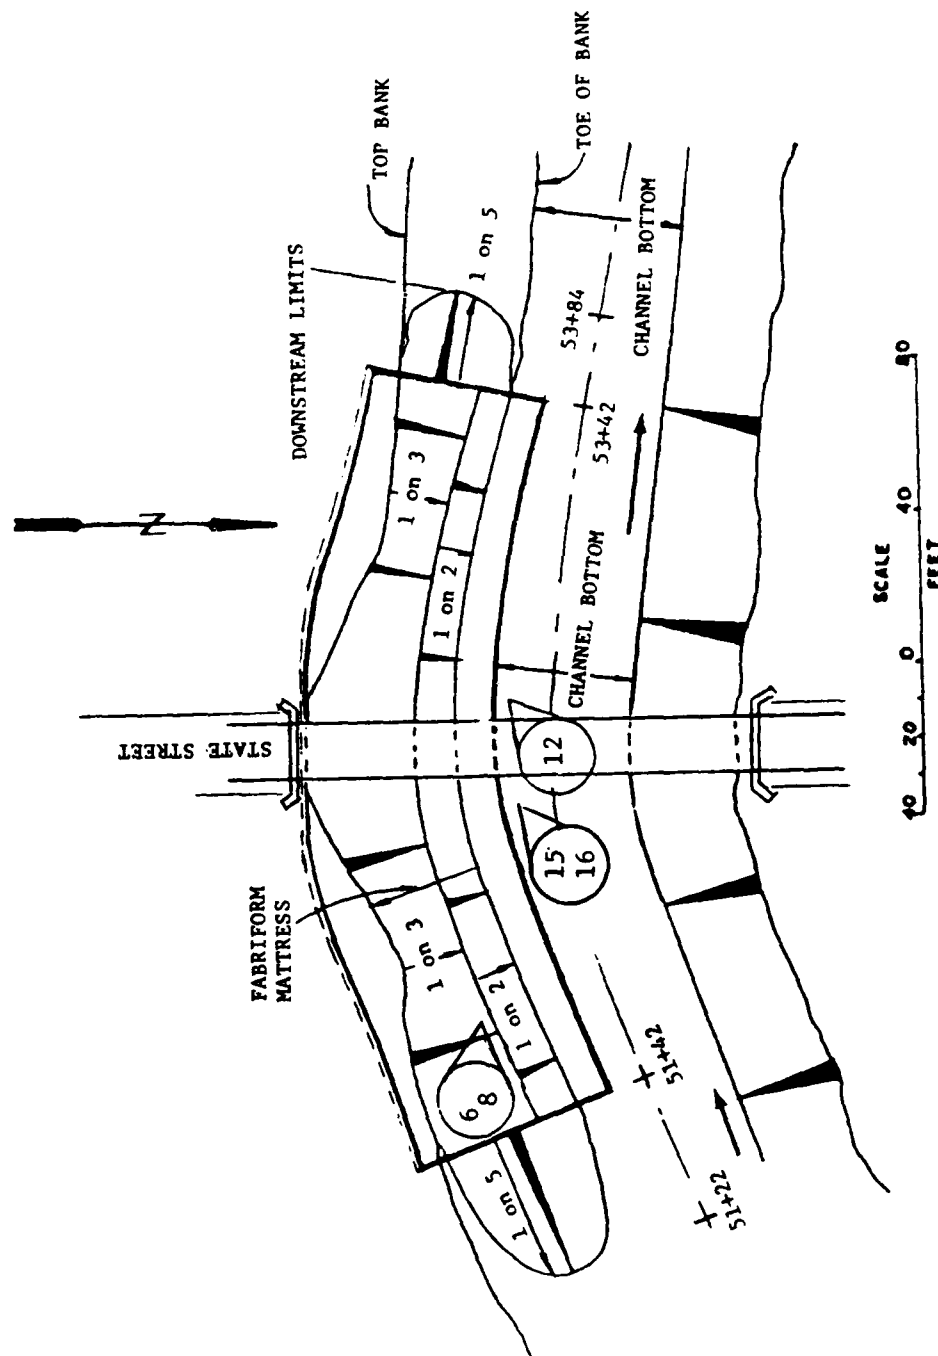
102 River (East Fork) at Bedford, Iowa. Plan view of Fabriform revetment of left bank at State Street Bridge (sta 52+42). Orientation of field-of-view and location from which photograph was taken are represented by  for Figures 6, 8, 12, 15, and 16.
